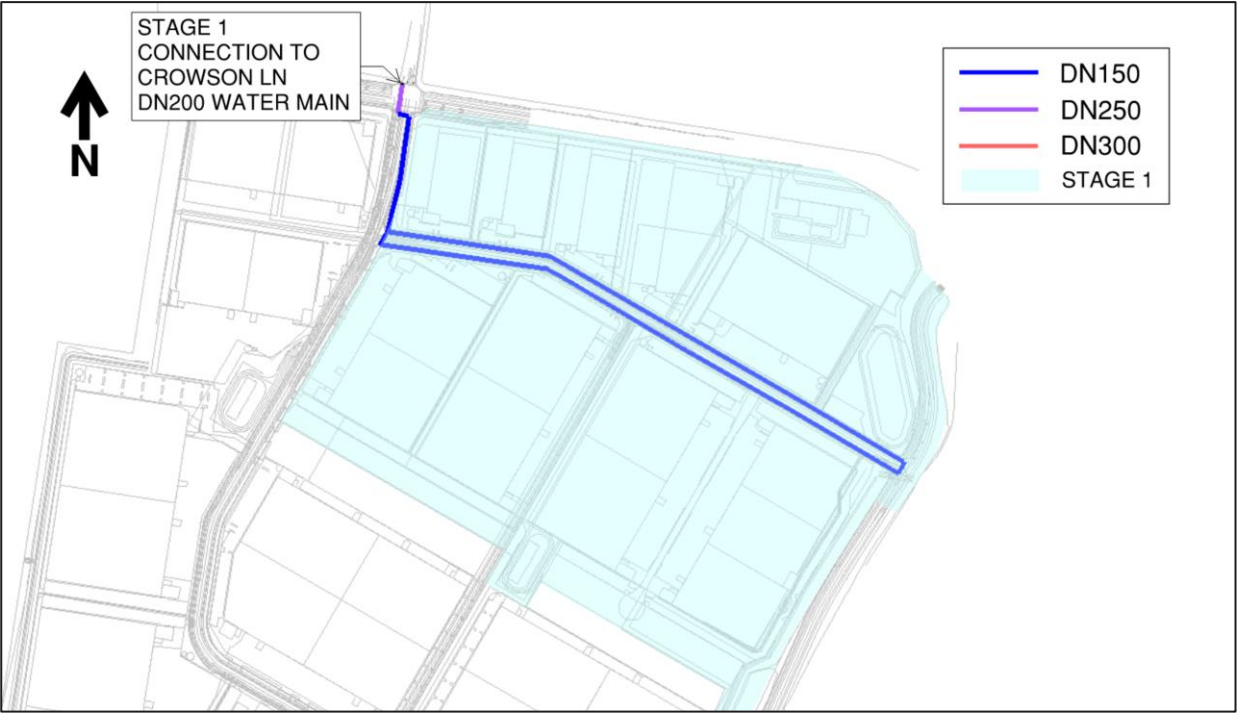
Concept Stage 1 Internal Water Network Layout
